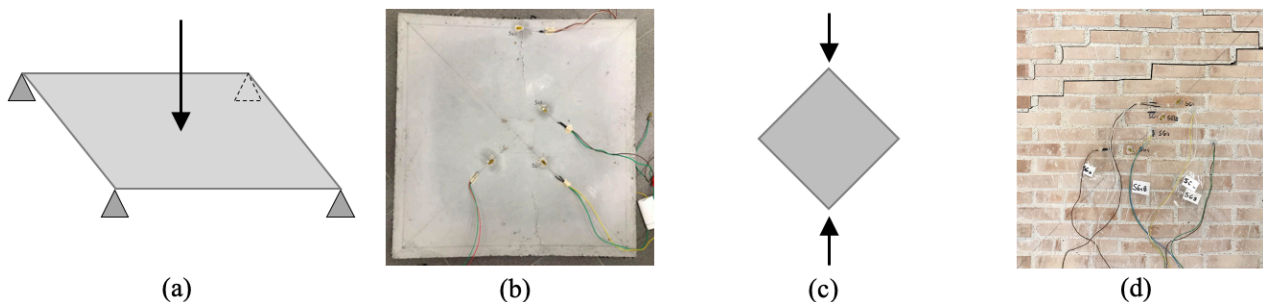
Five-point out-of-plane bending test (a) on an instrumented FRP concrete plate brought to fracture (b). In-plane diagonal compression test (c) on an instrumented masonry panel brought to fracture (d).
